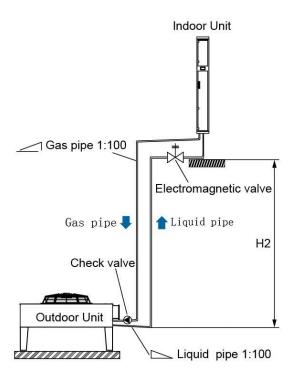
Installation drawing (when the condenser is lower than the indoor unit)
